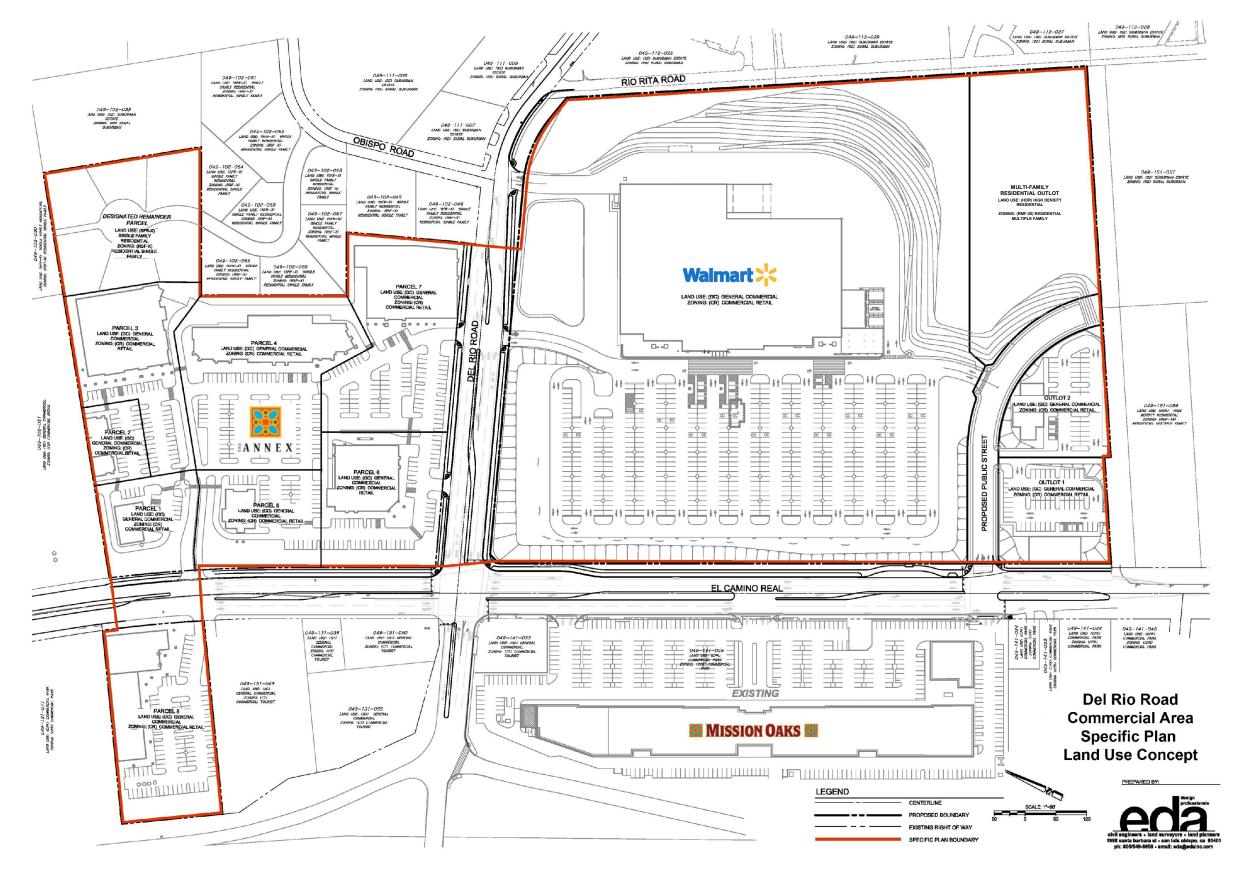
MAJOR TENANT PROJECT SITE CONCEPTUAL SITE PLAN
